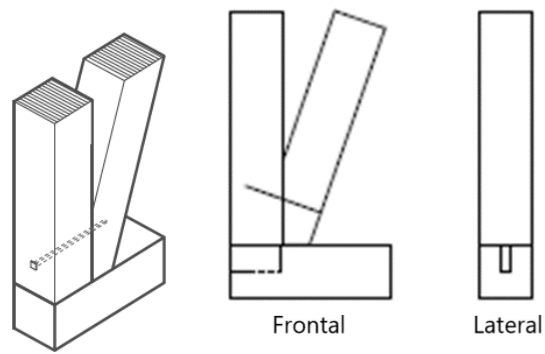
Connection by contact (a) Diagonal and timber frame connection. (b) Frontal and lateral view.
